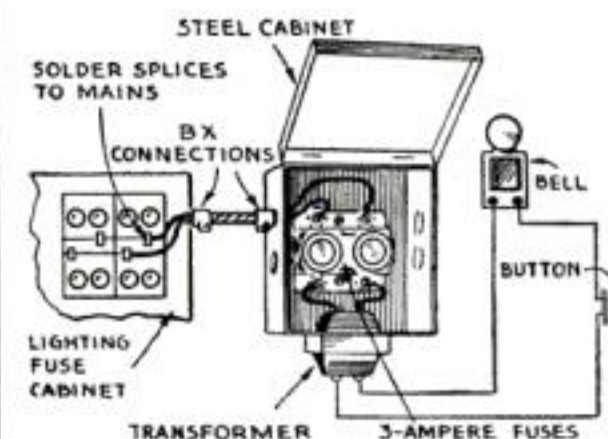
Bell transformer built into a steel cabinet with a properly fused cut-out block.
